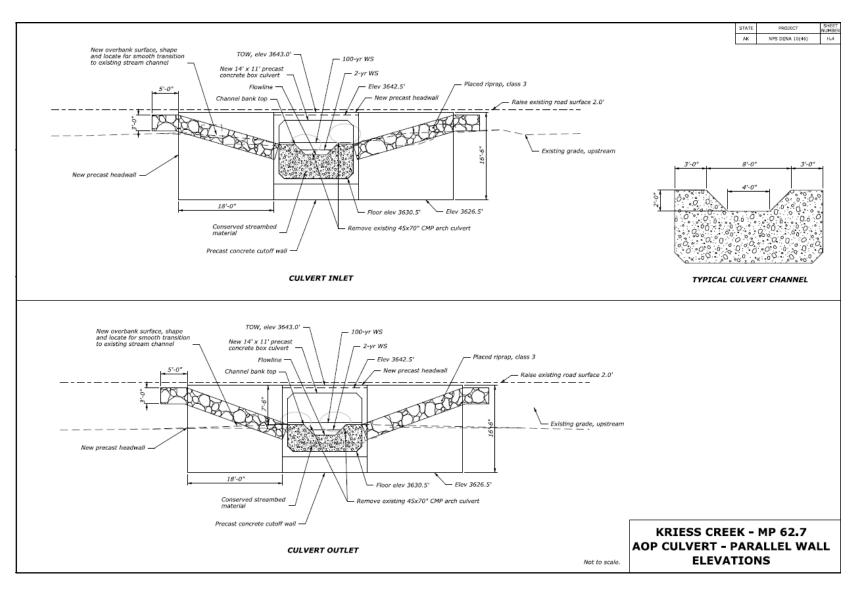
Krier's Creek Culvert Parallel Wall Elevations
